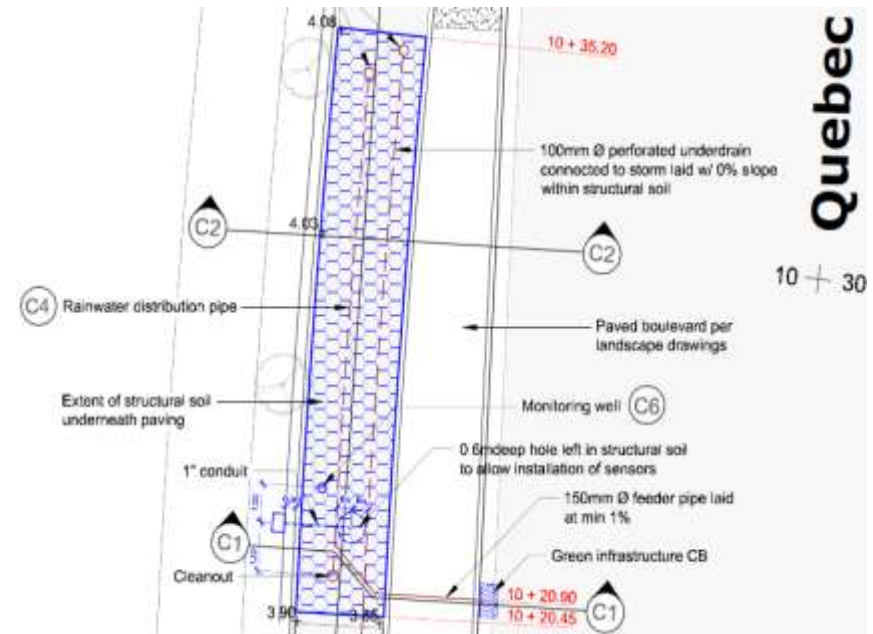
Design plan for the northwest corner of Quebec St. and 1st Ave. boulevard reconstruction with structural soil under the bike path.
